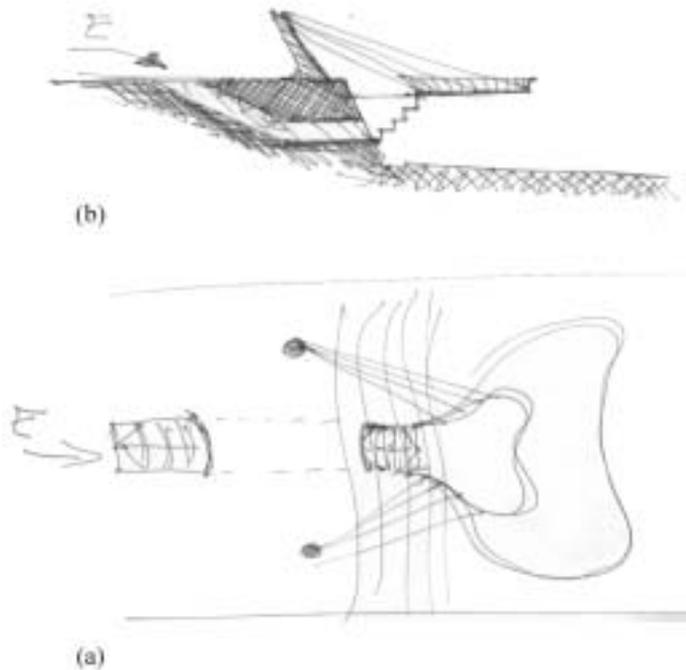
Sketch I (ill-defined problem). (a) Plan and (b) Section drawings of the viewing terrace – maximum and minimum contact with the ground.
